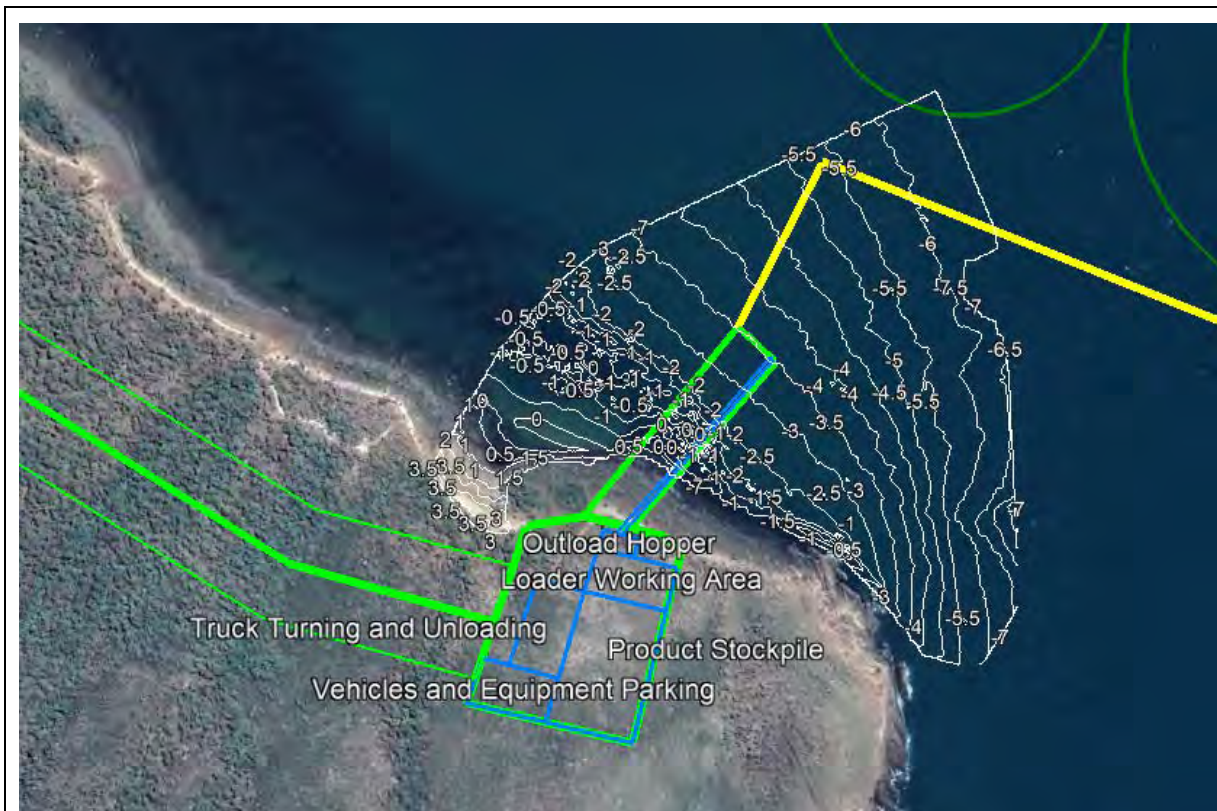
Bathymetry at the site of the proposed barge ramp (Sub-options 1a and 1b).
